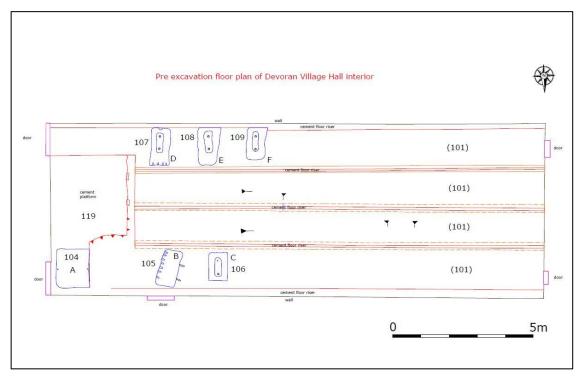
Pre excavation floor plan of the main hall within Devoran Village Hall, showing large granite blocks or setts and floor joists.
